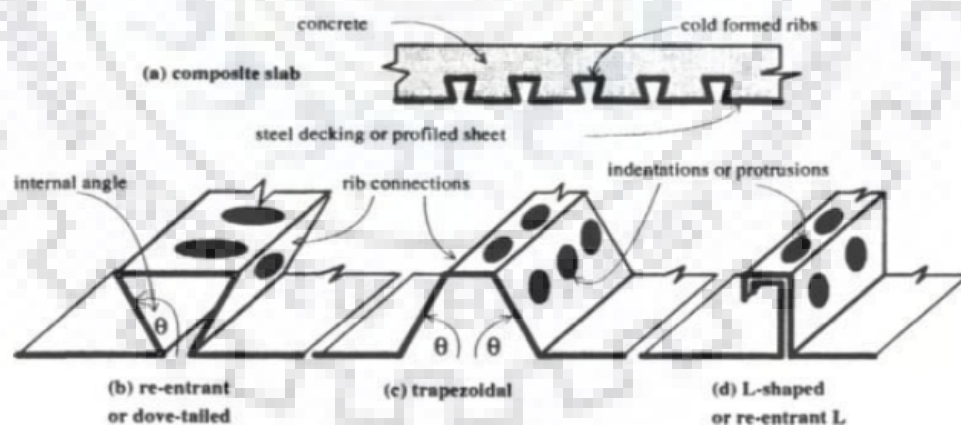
Composite profiled slabs (Oehlers D.J., Bradford M.A., 1999)
